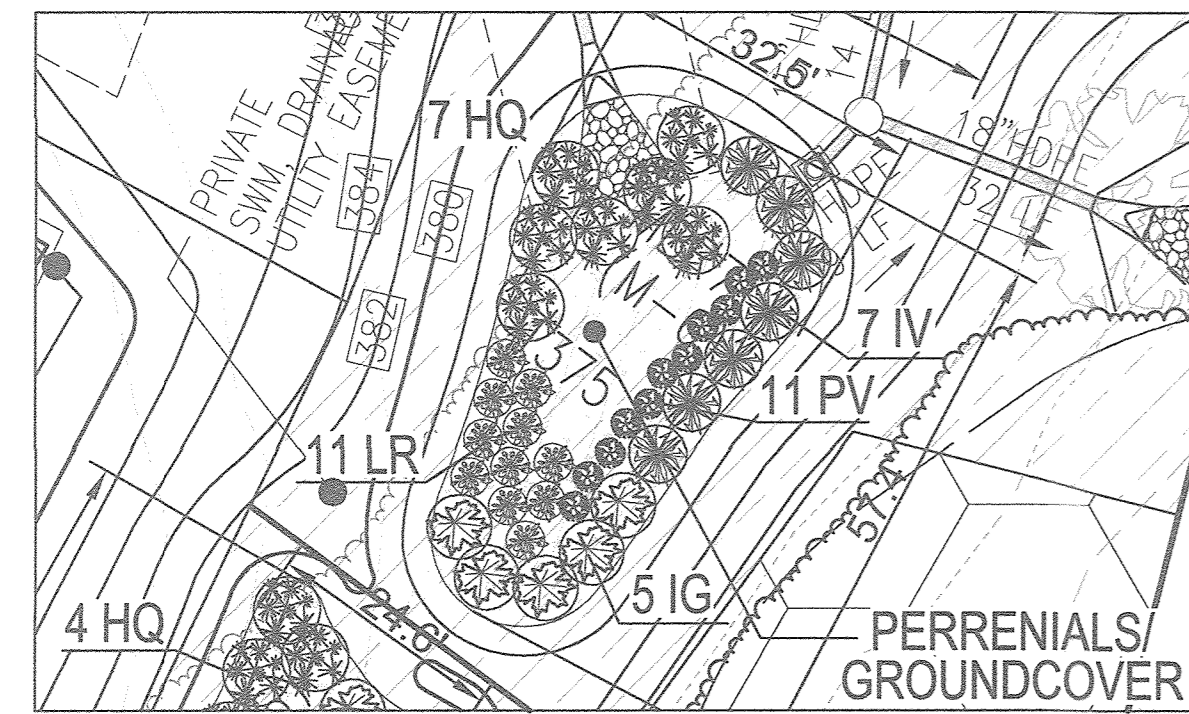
DETAILED BIO AND PLANTING PLAN (SWM #4)
